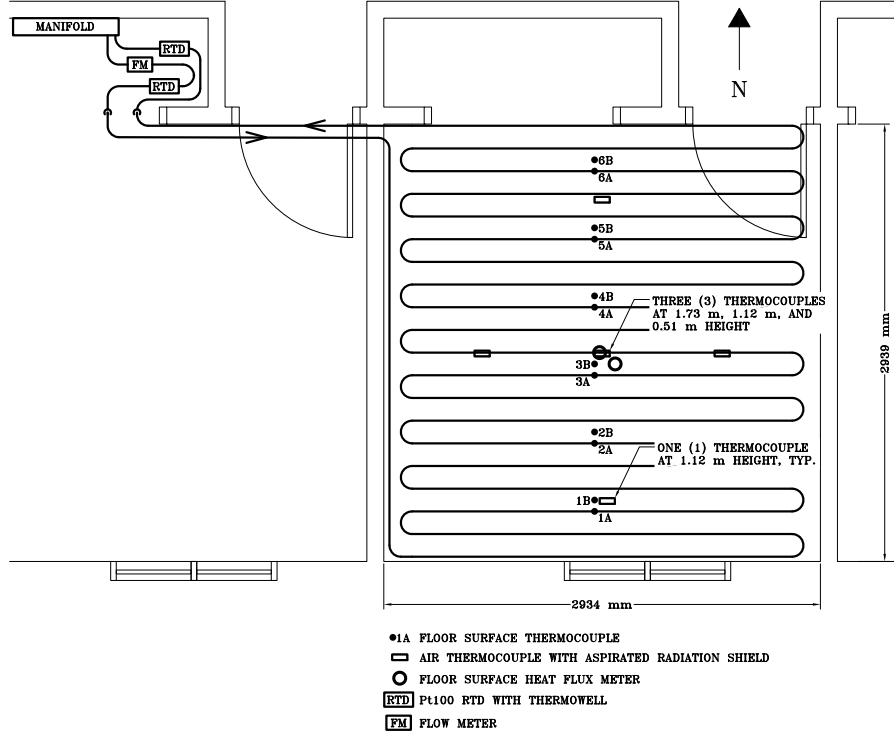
Plan view of instrumented room with instruments locations (floor plan adapted from drawings by Urbandale Construction)
